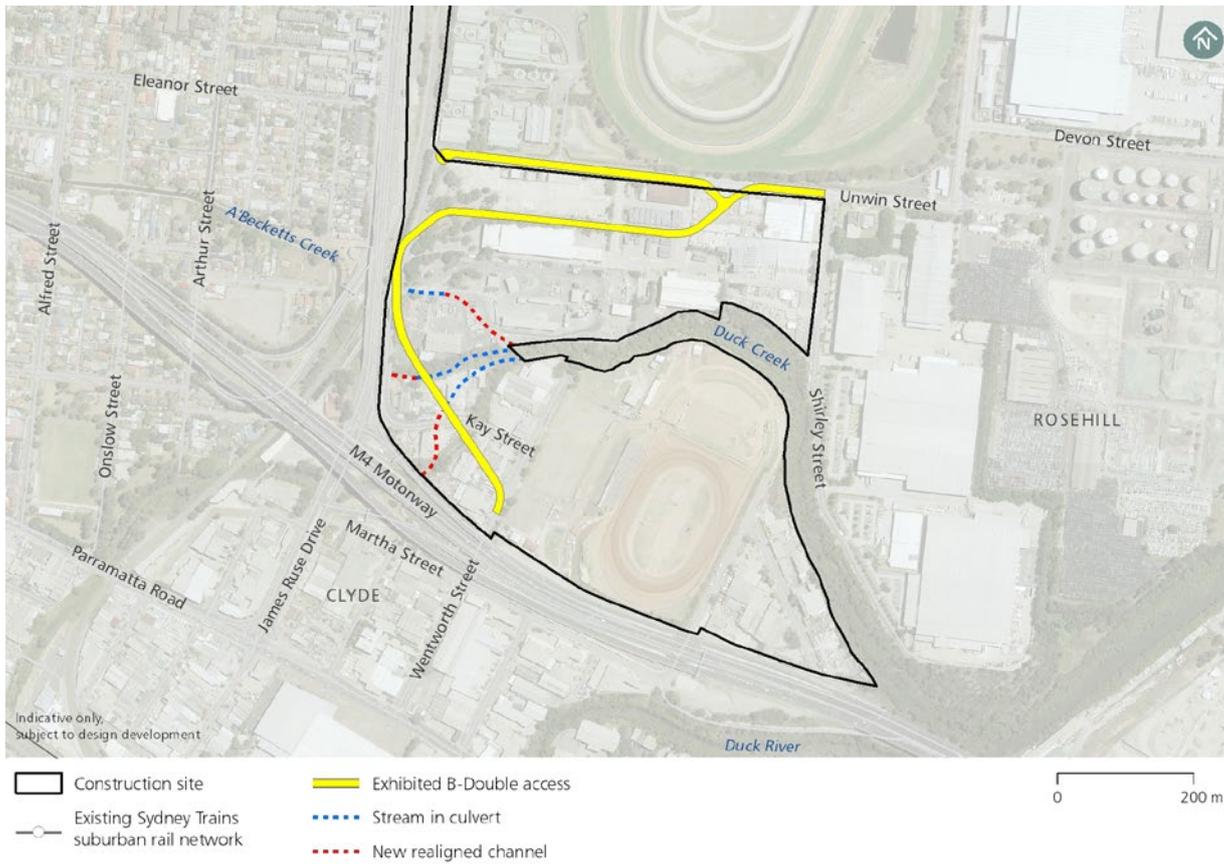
Exhibited Kay Street and Unwin Street route and creek alignment works
